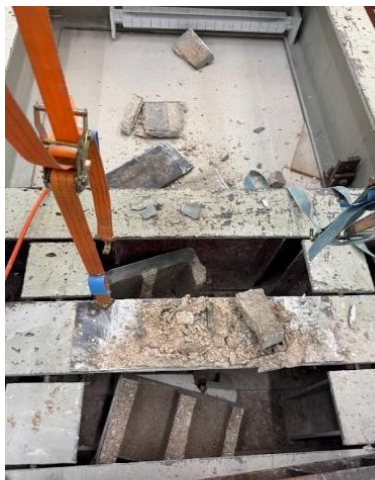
Initial Cracking of Fully Embedded Mortar (fully capped) and Dry Joint Wallettes
